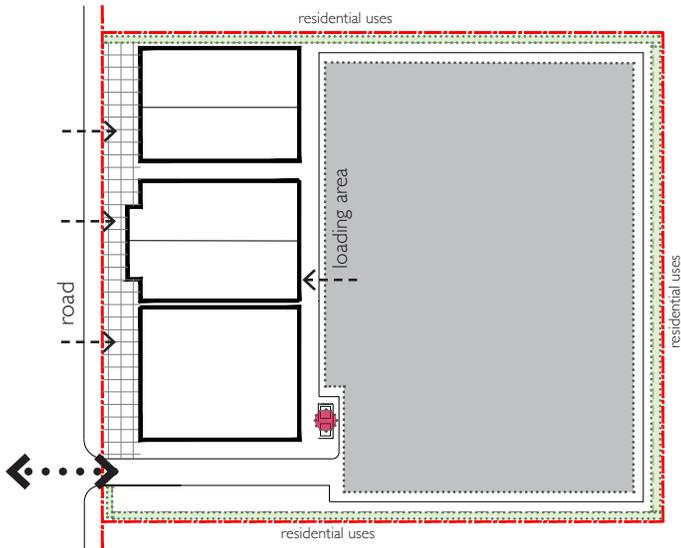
Commercial buildings fronting onto the road (Hamlet condition). Plan demonstrates consolidated access to rear surface parking for multiple commercial buildings
